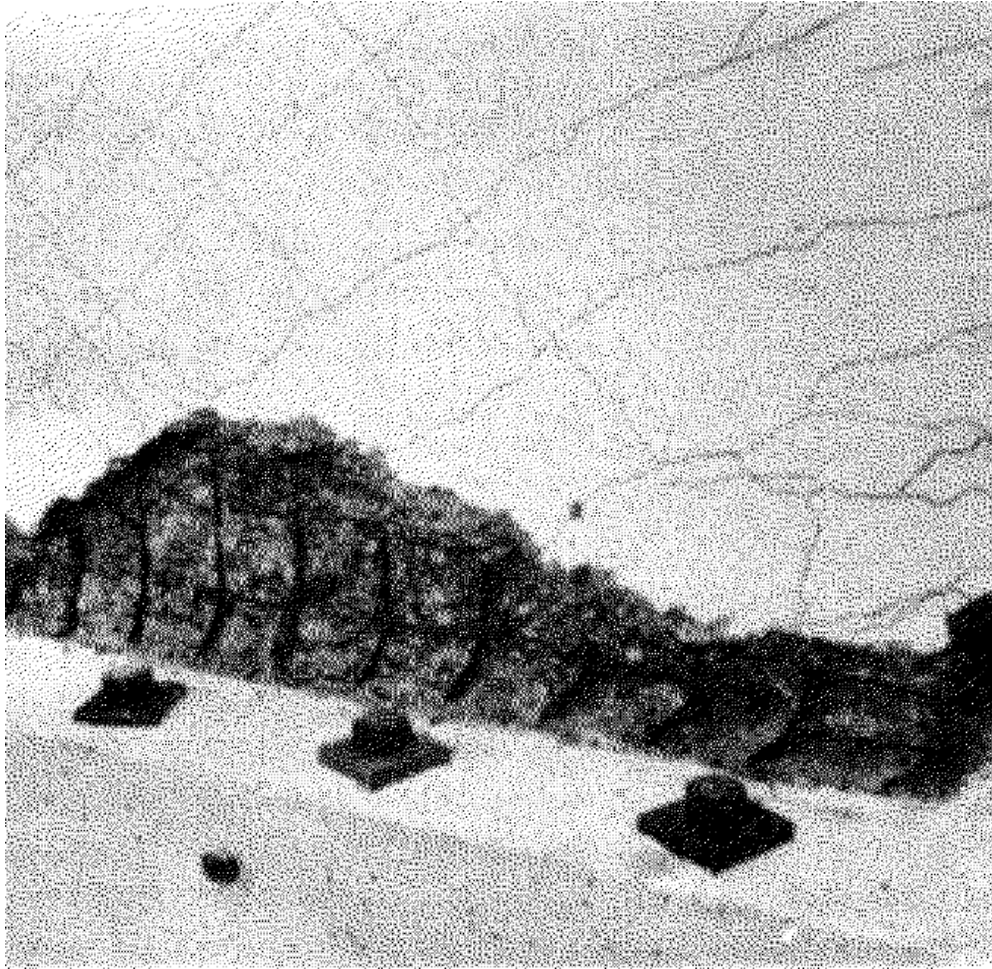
Sliding shear failure (Paulay et al., 1982)
